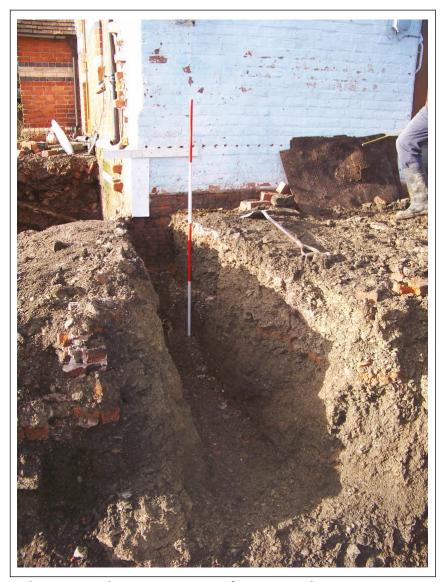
South Facing Section of Area C. Looking W. Scale 2m.
